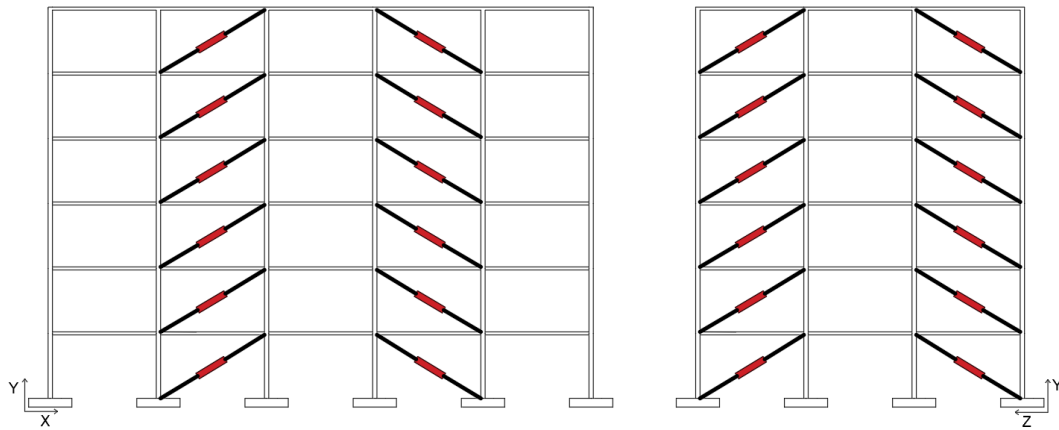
Layout of the diagonal steel braces equipped with hysteretic dampers installed in the case-study structure
